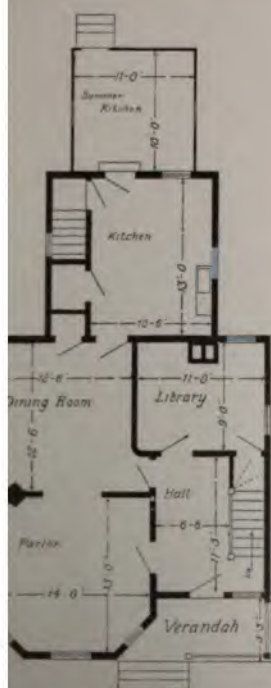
HOUSE FOR EMPLOYEES, PLAN J
